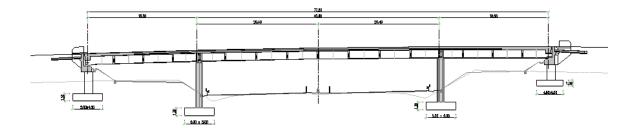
Elevation view of the composite bridge (SBRI, 2013)
